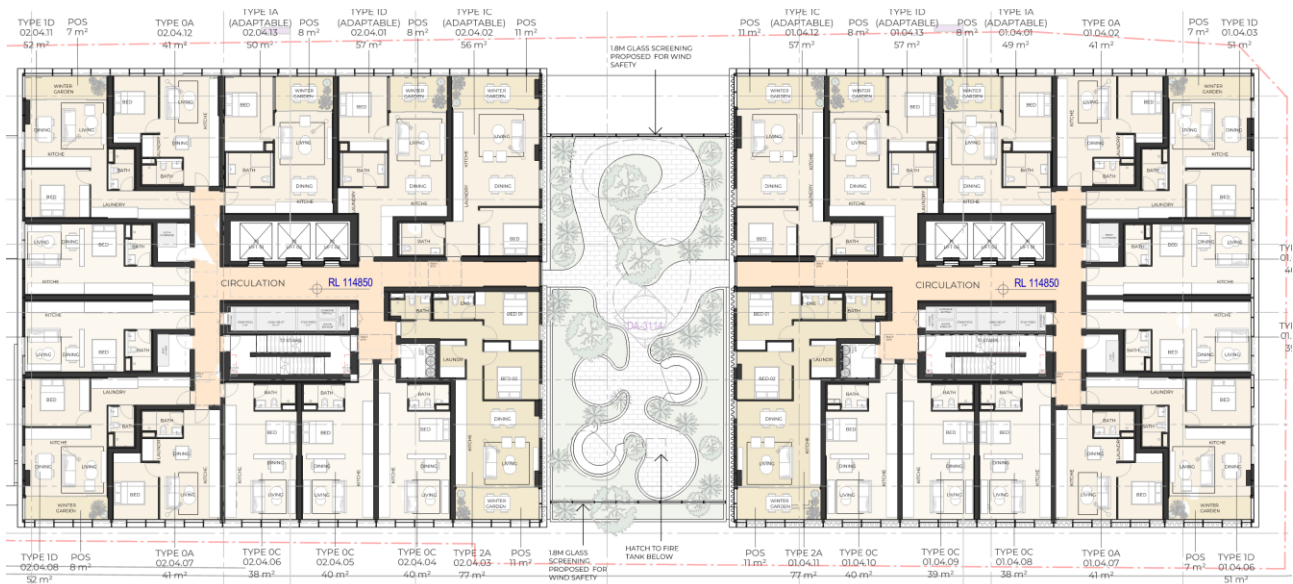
Amended Level 3 outdoor terraces (Source: Woods Bagot)
